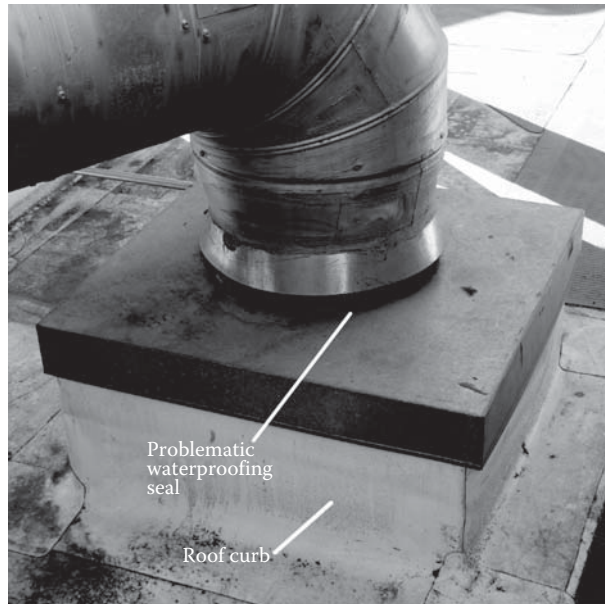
Vertical duct penetration through a roof cap flashing.
